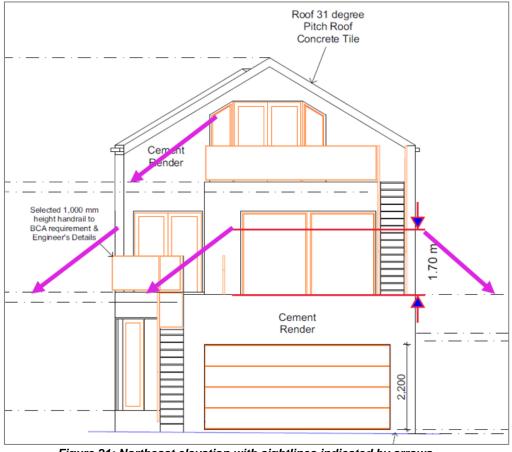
Northeast elevation with sightlines indicated by arrows (Source: Benyana Building Design, overlay by Council)
